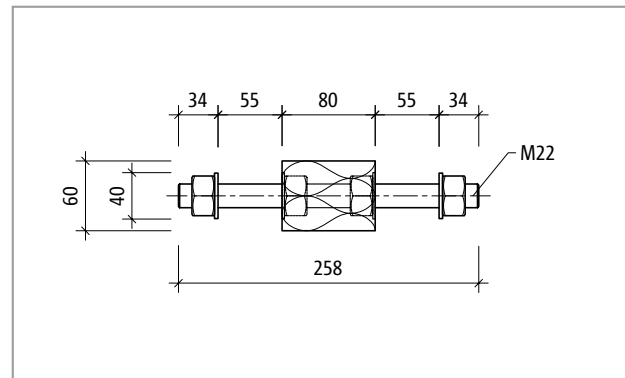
Schöck Isokorb® T type S-N-D22: Cross section of the product
